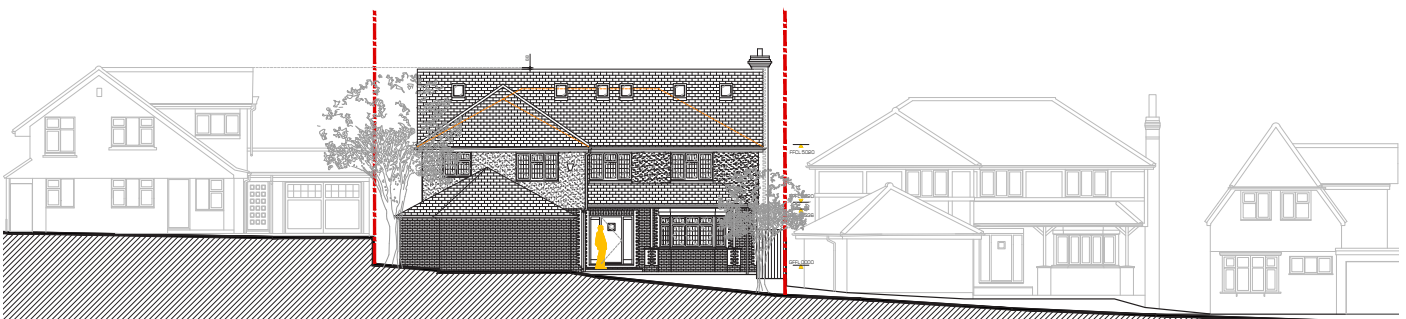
Application 22/01802/FULL Proposed Front Elevation
